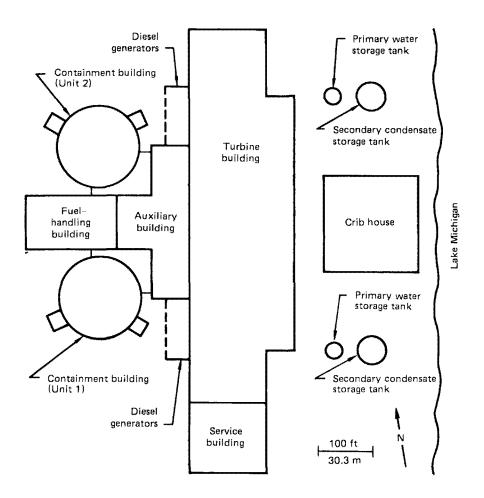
Site plan of the Zion Nuclear Power Plant.
